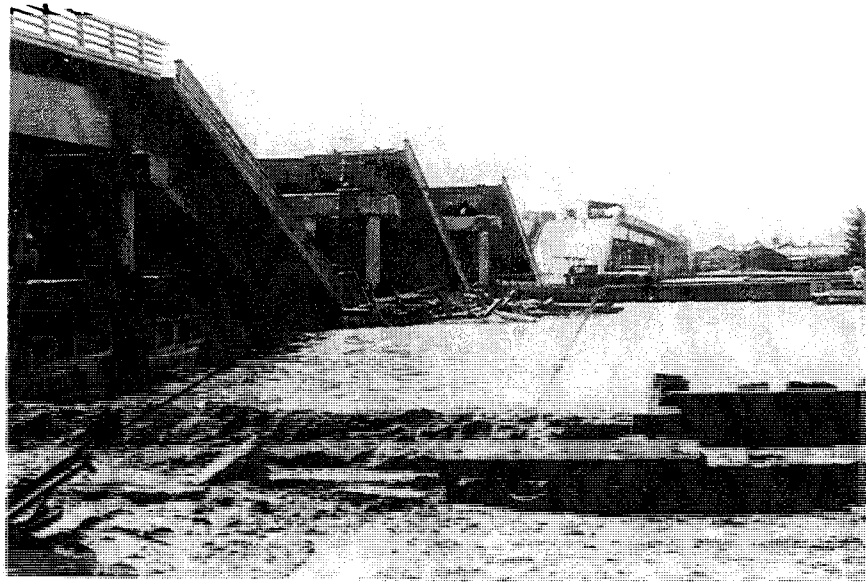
Showa highway bridge that collapsed into the Shinano River during the 1964 Niigata, Japan earthquake (from T.L. Youd photo collection).
